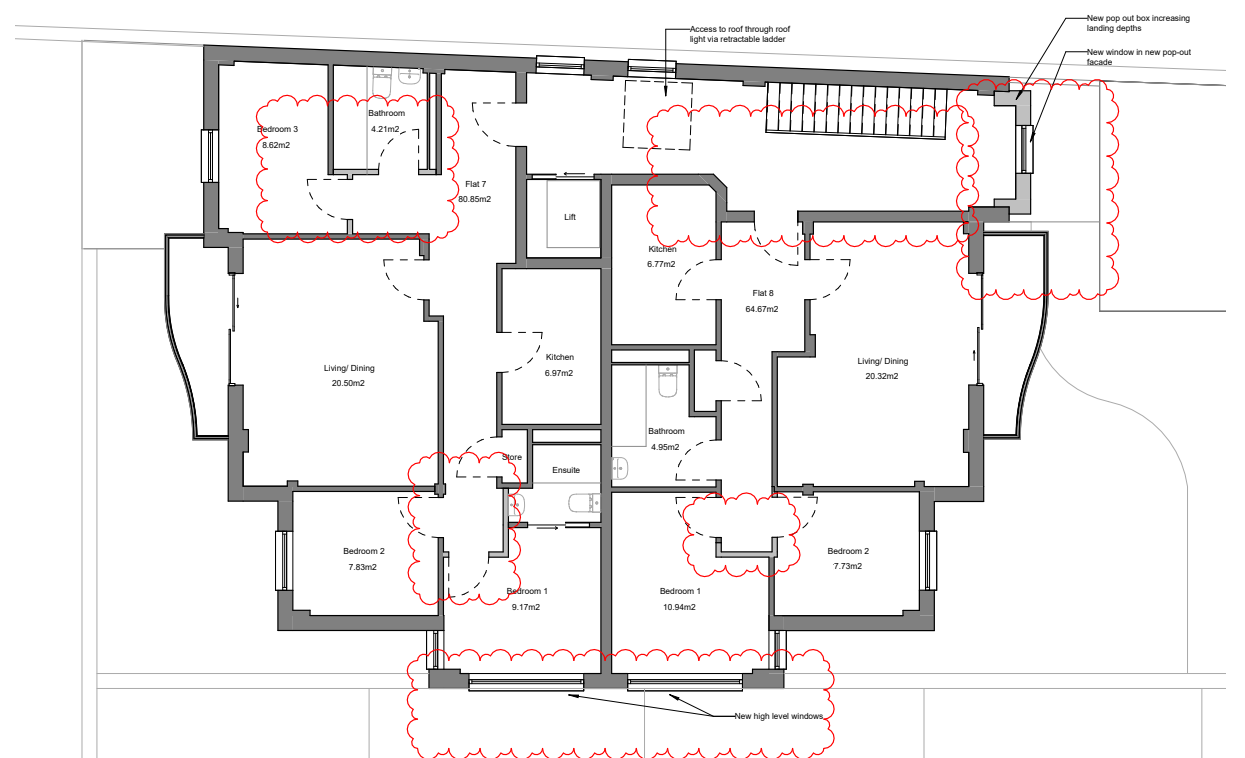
BLOCK 3 PROPOSED SECOND FLOOR PLAN
